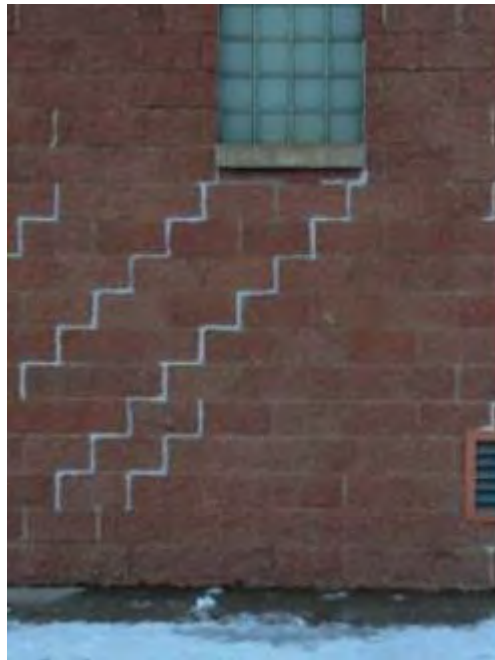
Common cracking pattern in lightly loaded structures on expansive soils.
